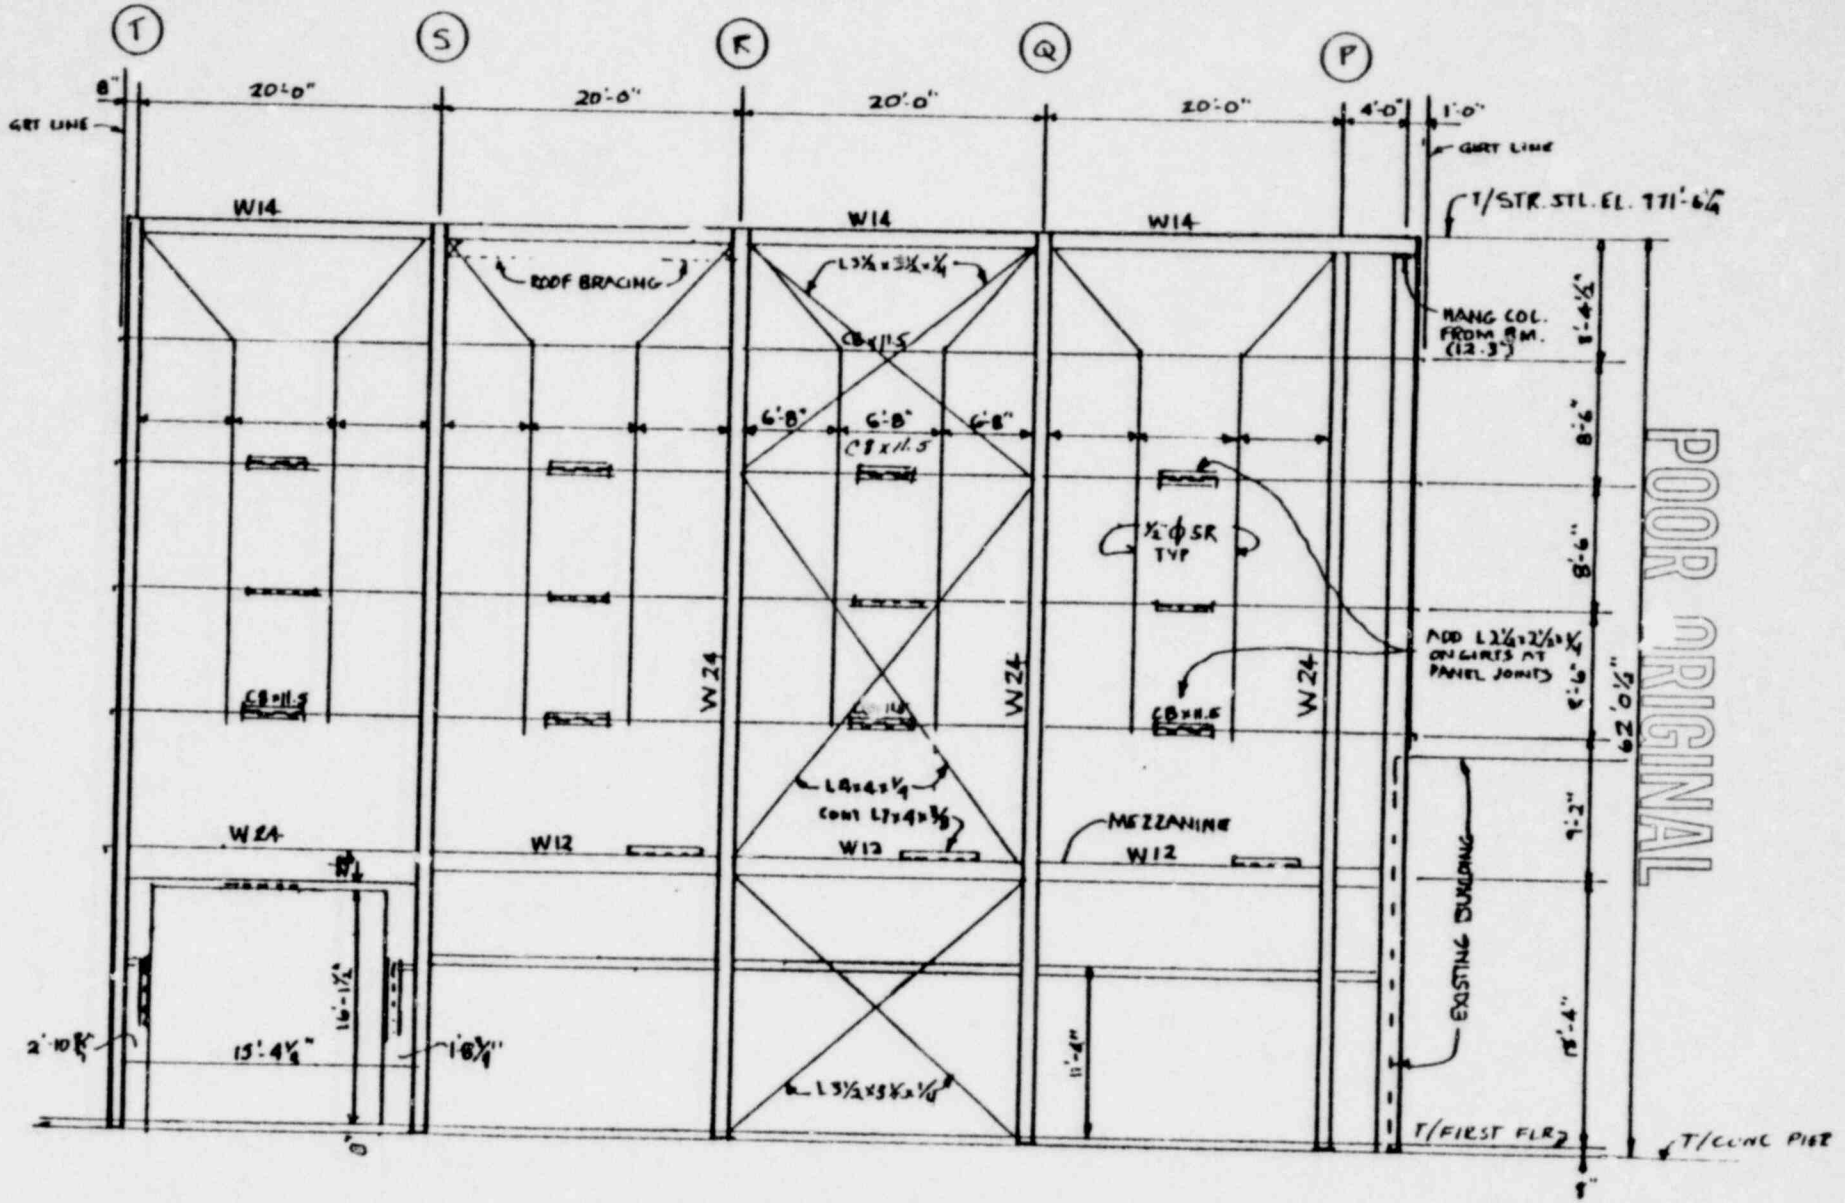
JN-1B NORTH WALL BRACED FRAME
